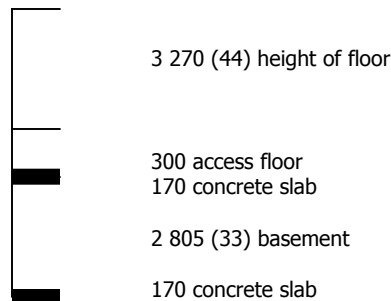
The floor to ceiling heights of DiD furniture warehouse – in section.
